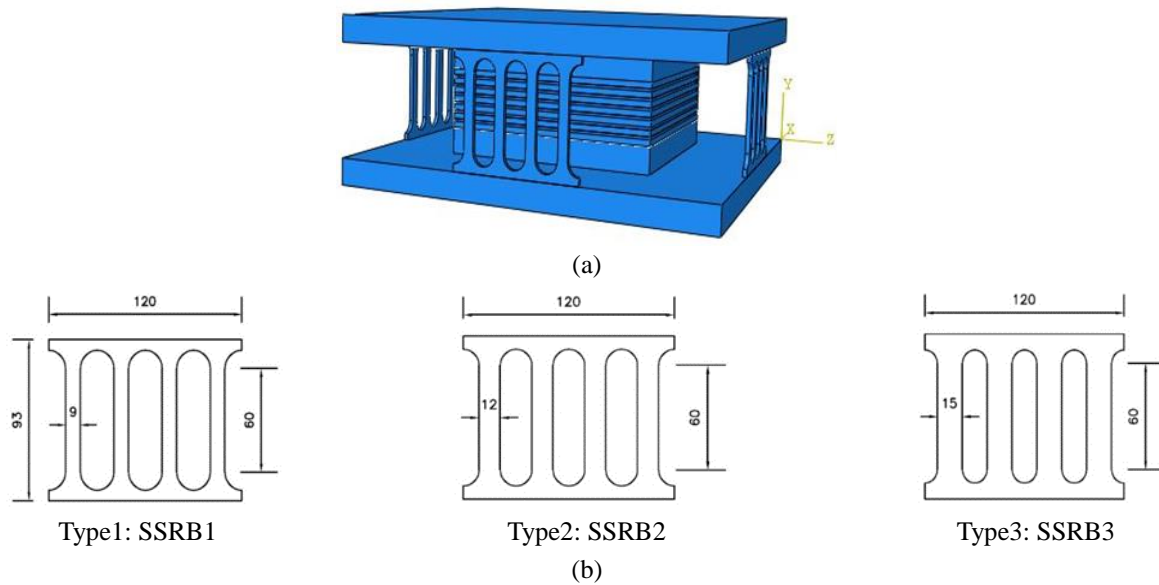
(a) Full view of the SSRB. (b) Types of slit steel dampers (all dimensions are in mm)
